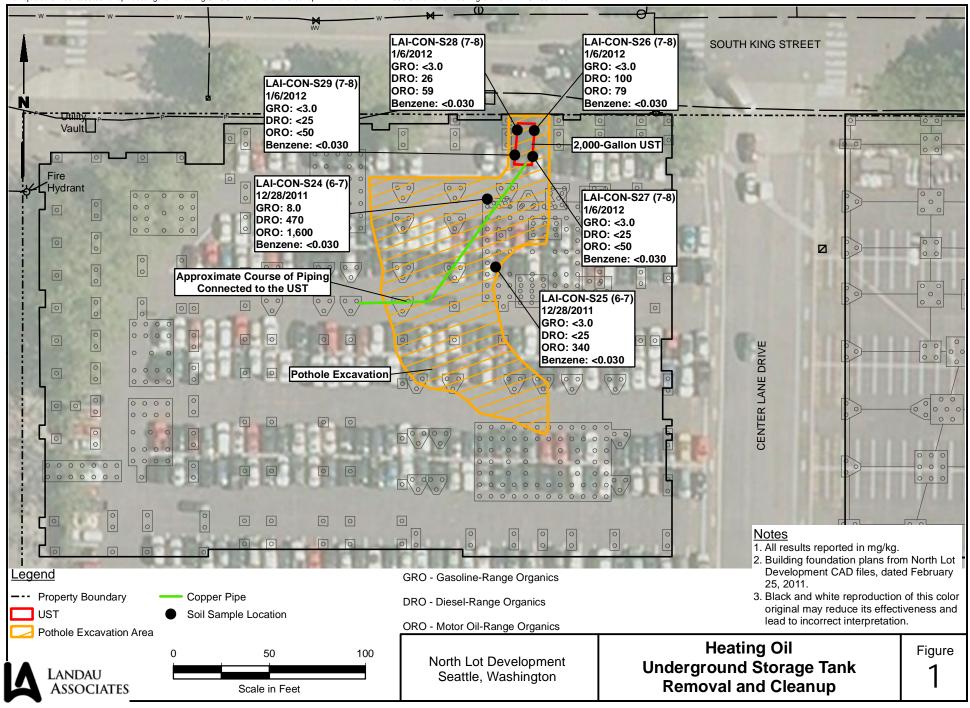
Heating Oil Underground Storage Tank Excavation and Confirmation Sample
